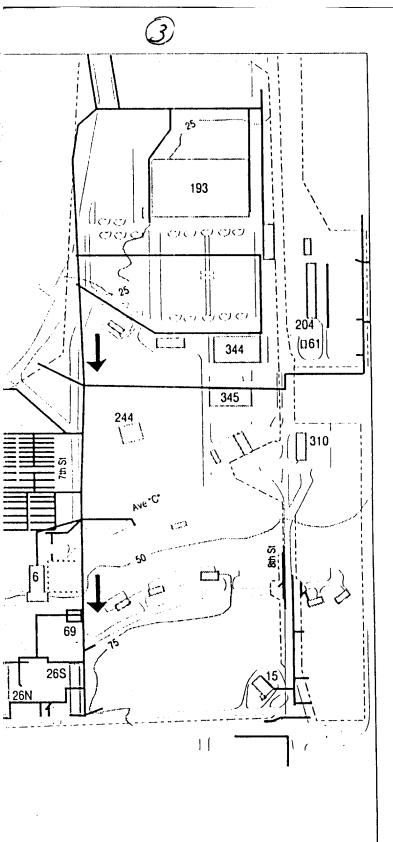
Stormwater Drainage System at Sand Point Naval Station
